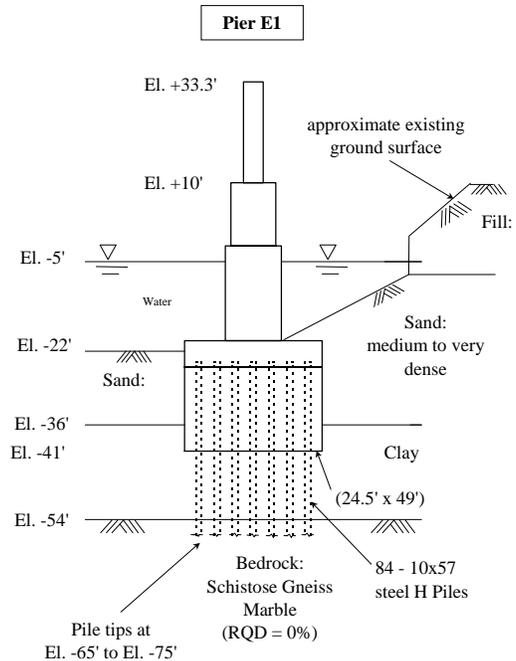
Elevation of Pier E1 foundation and soil profile of the Roosevelt Island Bridge.
